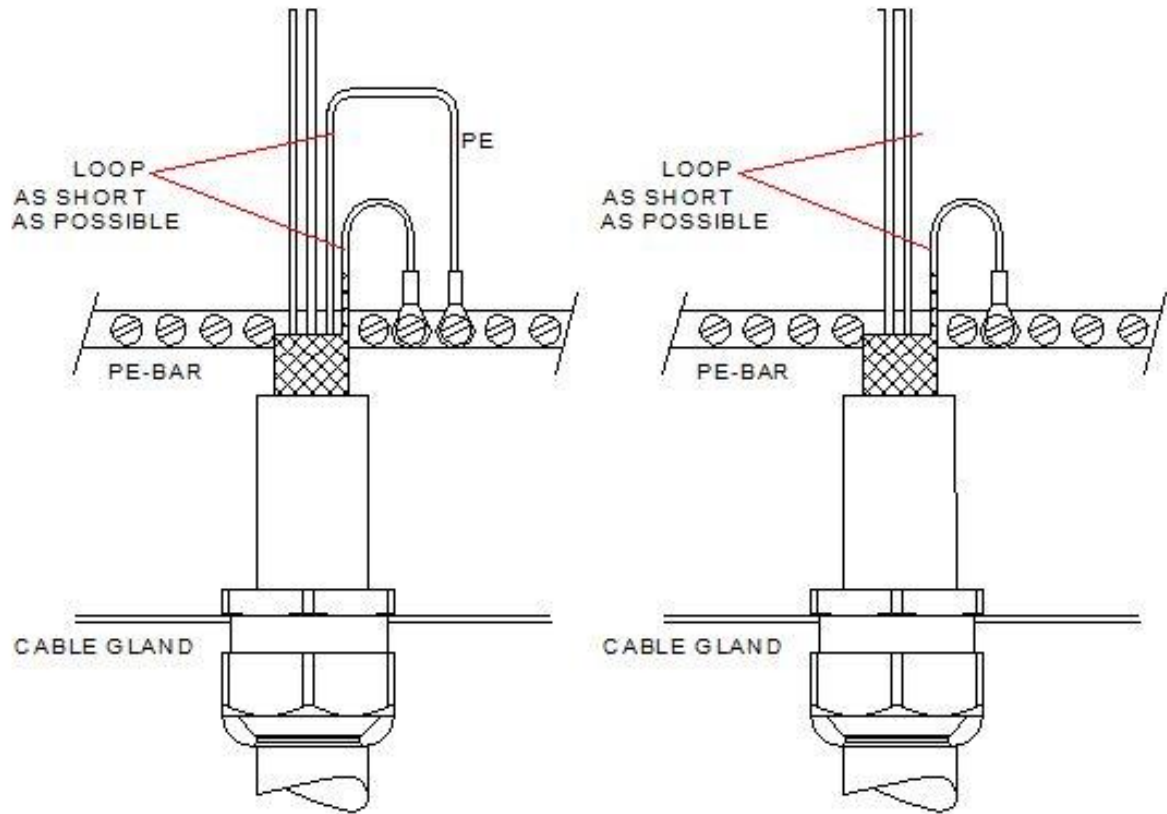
Detail power cable with cable shield or armour NOT preferred.
